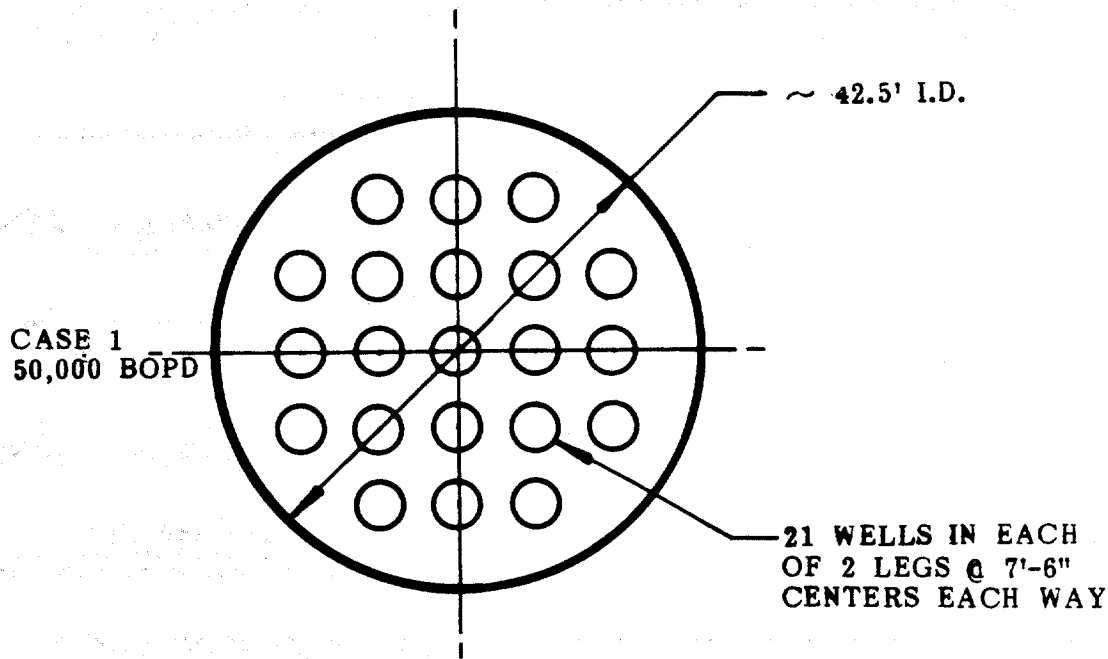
LEG/WELL/PILE ARRANGEMENTS
